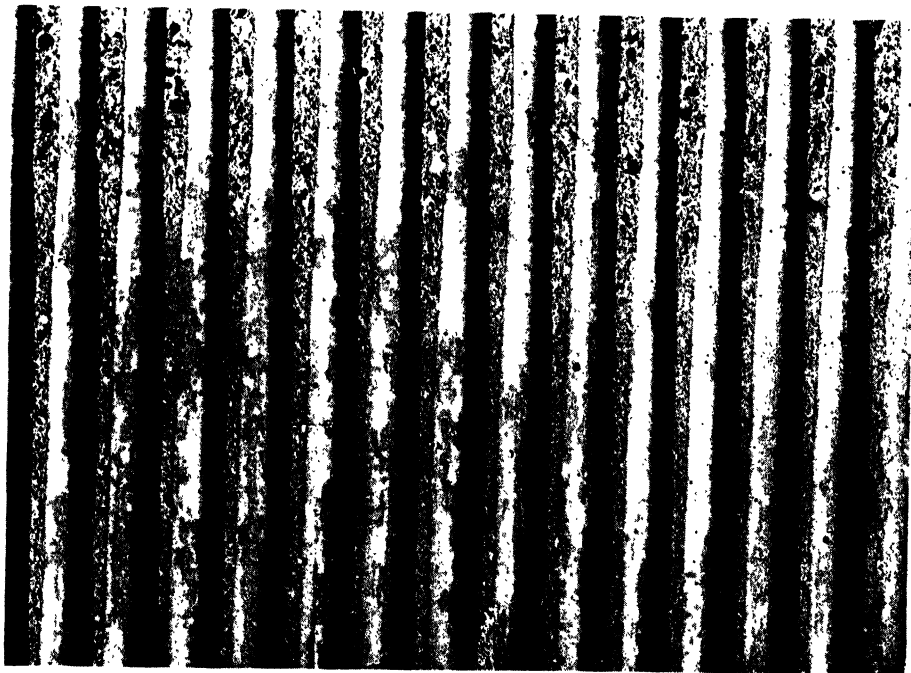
DETAIL OF RIBBED CONCRETE SURFACE ON THE ABUTMENTS OF TWICKENHAM BRIDGE, LONDON.
